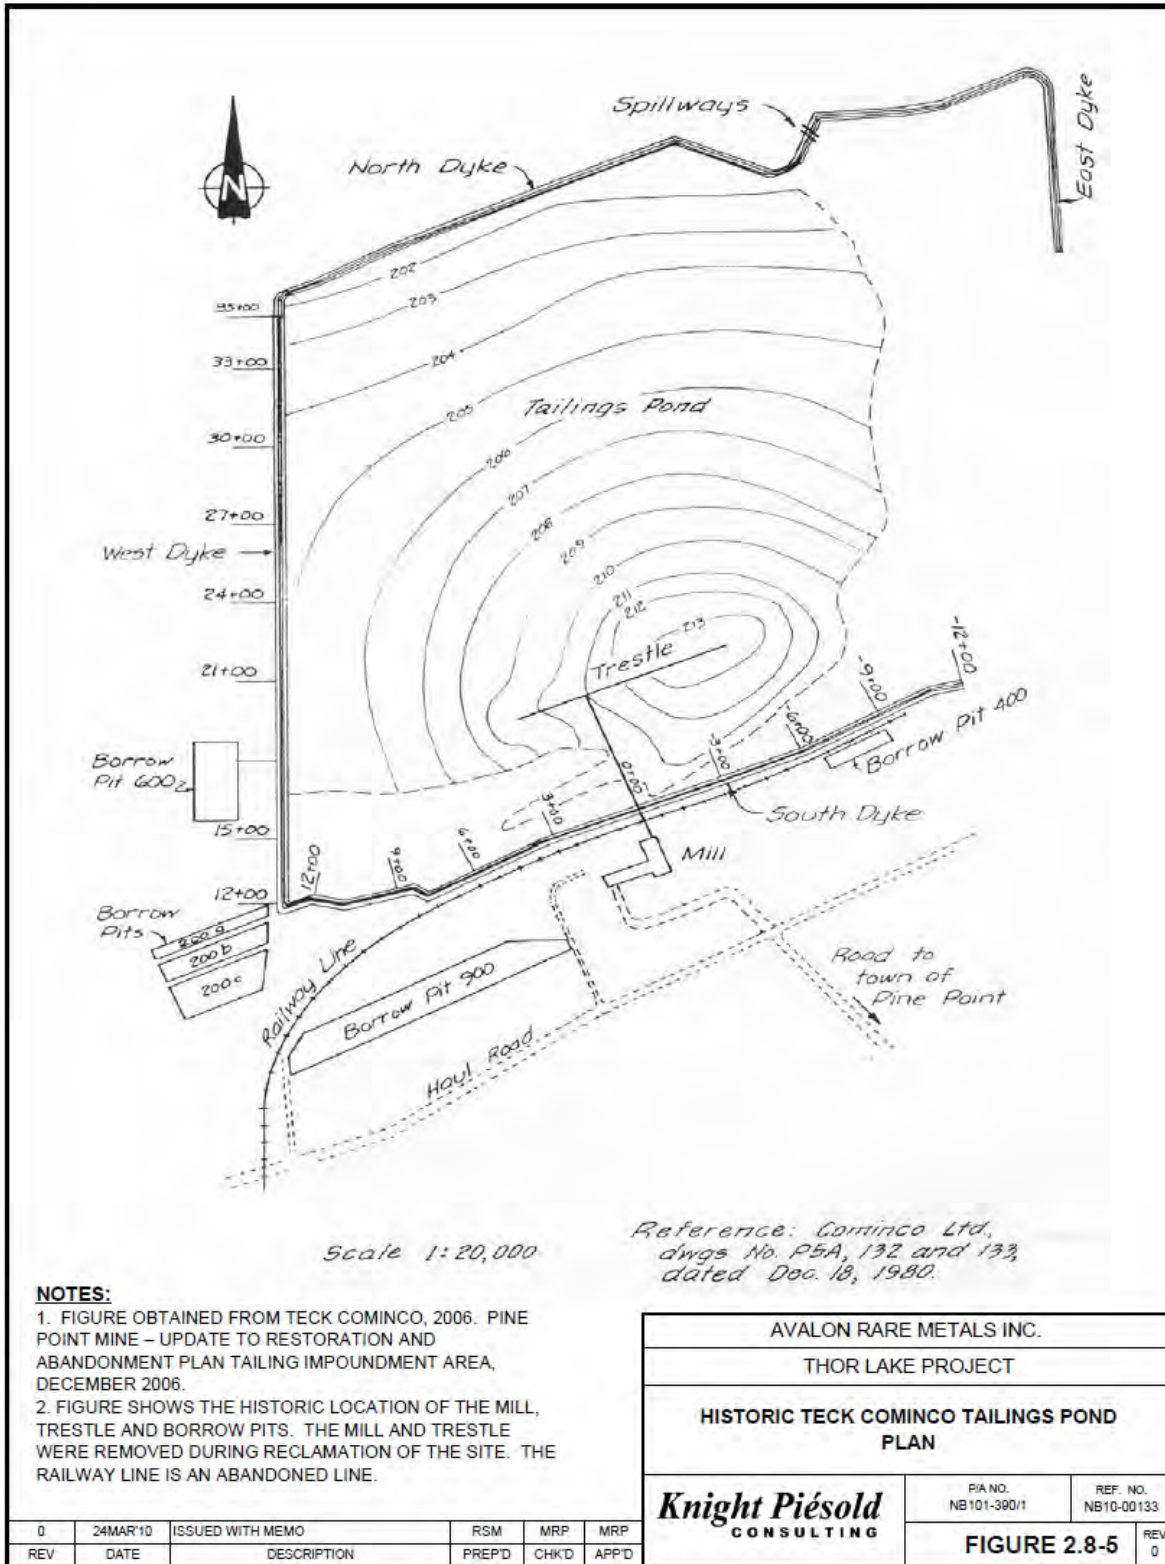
Historic Teck Cominco Tailings Pond Plan
